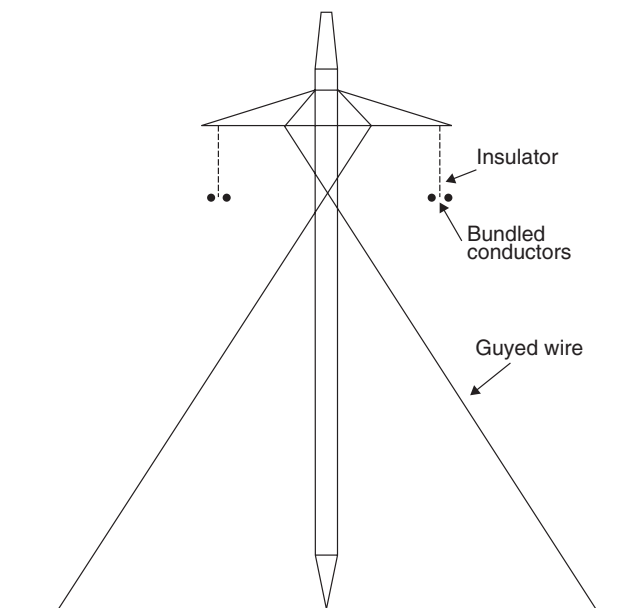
HVDC tower arrangement. (From Fink, D.G. and Beaty, H.W., *Standard Handbook for Electrical Engineering*, 11th ed., McGraw-Hill, New York, 1978.)
